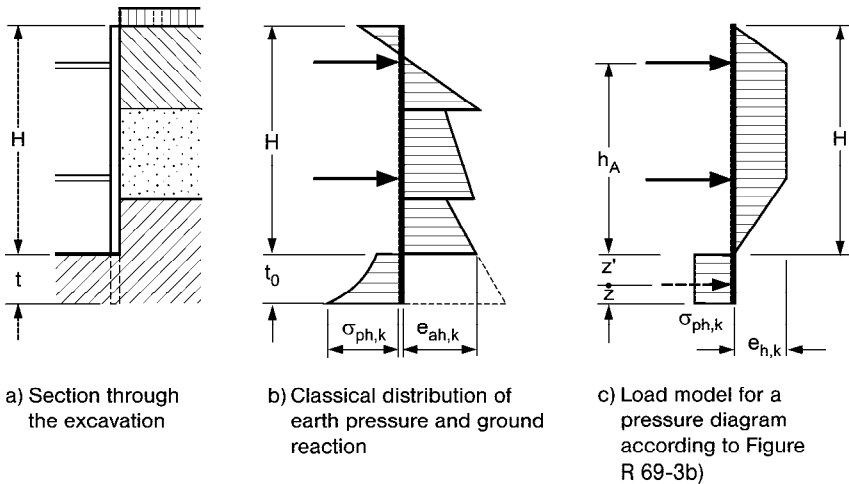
Load model determination for supported soldier pile walls when adopting active earth pressure and a free earth support (example of a double-propped soldier pile wall in stratified ground)
